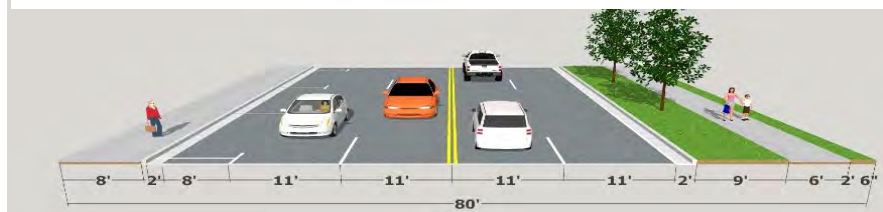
5/4 Lane Alternative A - 4-Lane Section with Northside Parking (Looking East, 11th Street to 8th Street)
